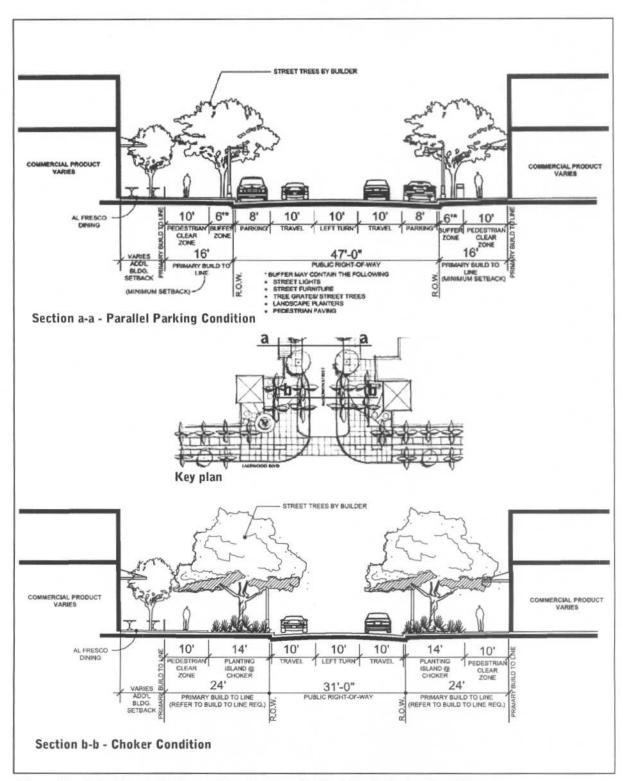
Main Street (McGowen Street) at Parallel Parking & Choker Condition
